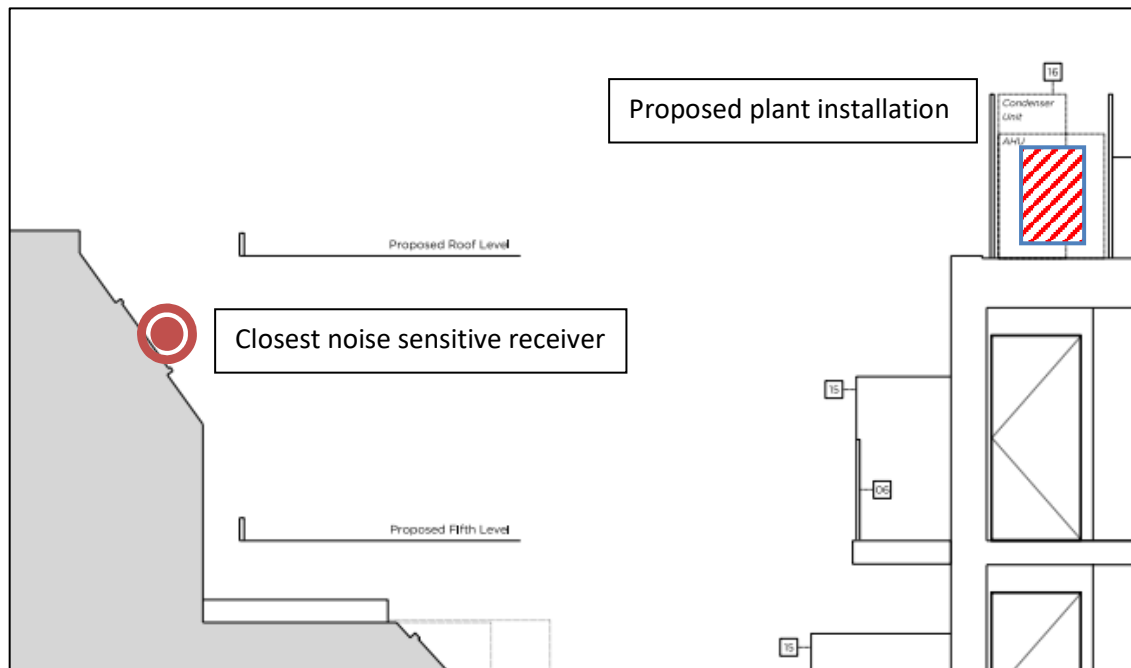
Section drawing showing the plant installation location and closest noise sensitive receiver
